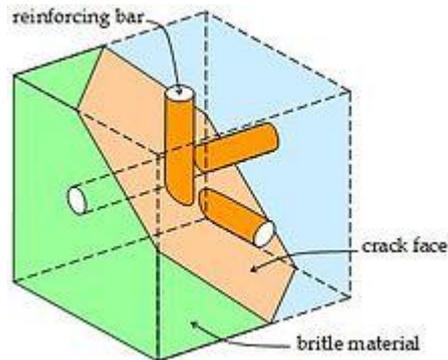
Small cube of a material with reinforcing bars. The cube is cracked and the material above the crack is removed to show the reinforcement that crosses the crack.
